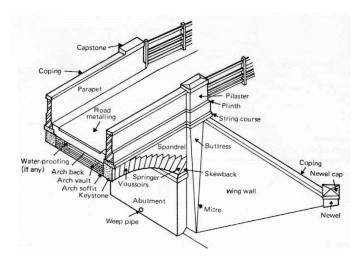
Terms of masonry arch bridge, from (McKibbins, et al., 2006)
